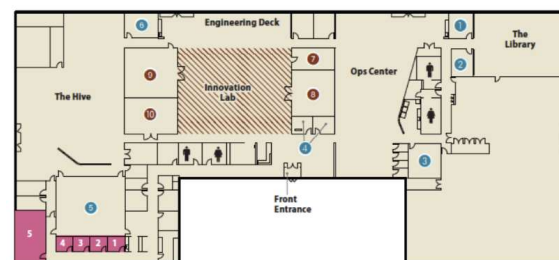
New Office Floor Plan (Bos et al., 2017)
